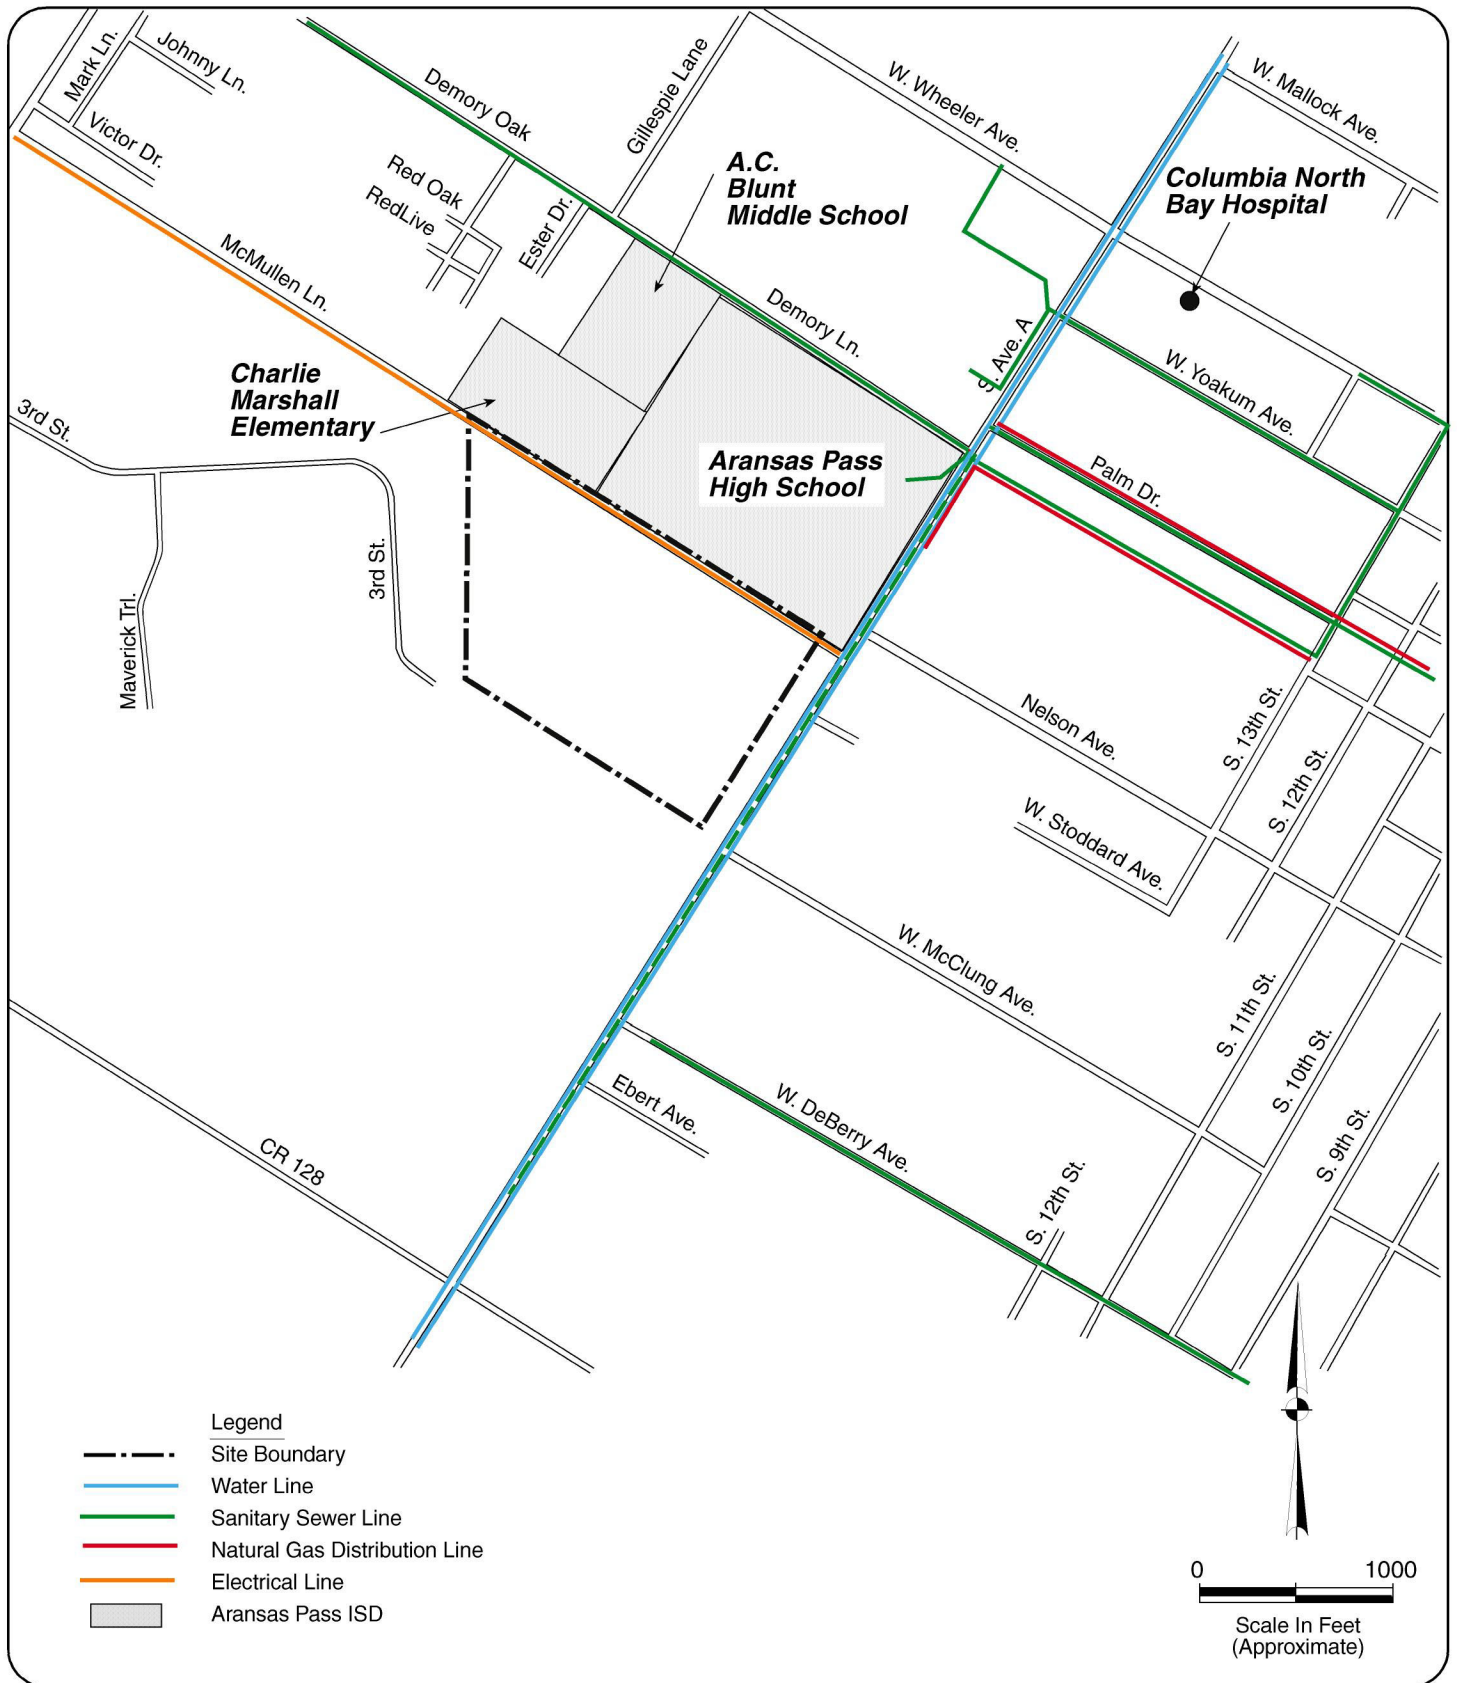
Existing Utilities - Alternative Site E, Aransas Pass (City of Aransas Pass, 2000b; TC&B, 2000b)
